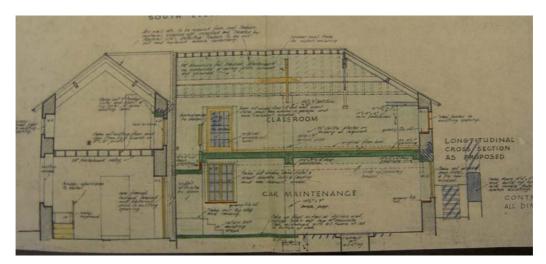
Coach House longitudinal cross section as proposed in 1966 (BDB 33/12/9 1966-9)
